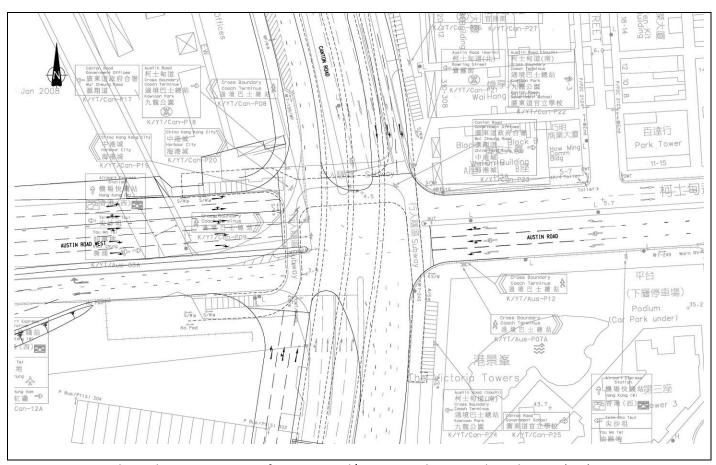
Planned Junction Layout of Canton Road/Austin Road West with Underpass (J18)
